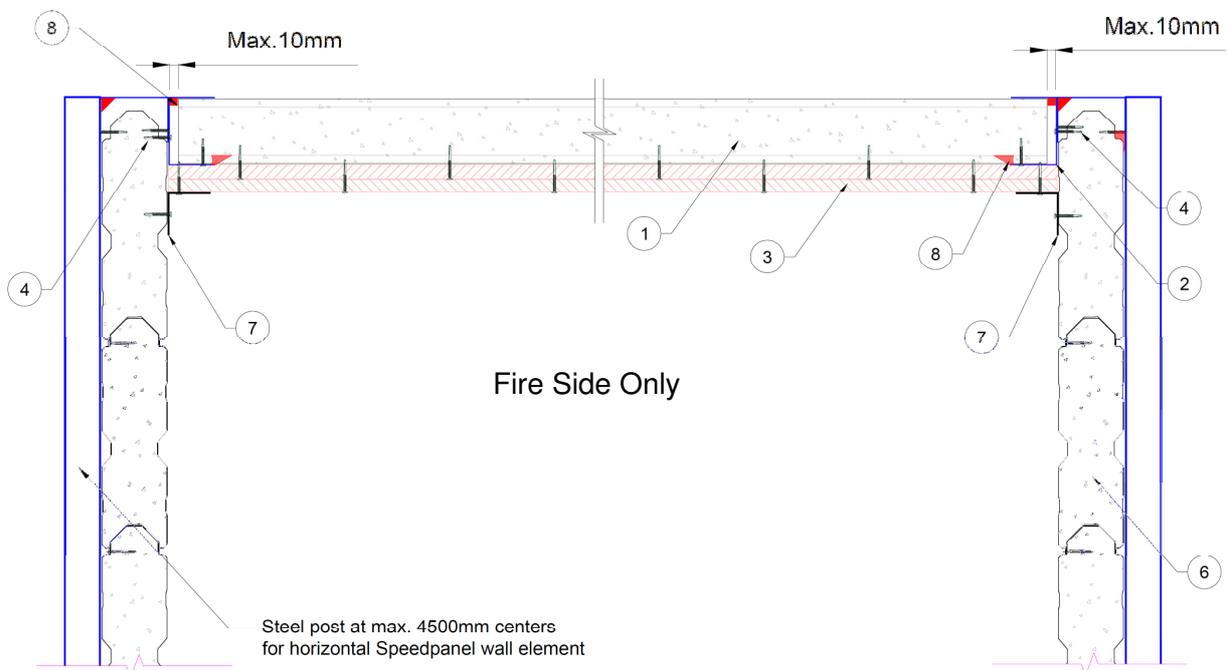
Speedpanel ceiling protected with plasterboard linings (Longitudinal Section View)
